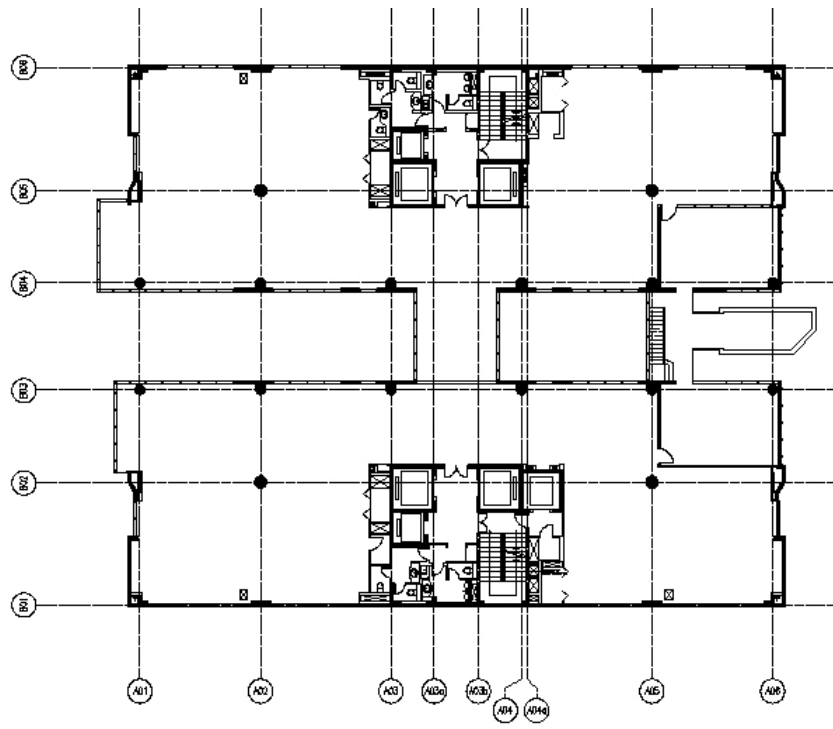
Birla Corporate Office, New Delhi: Fifth Floor Plan
